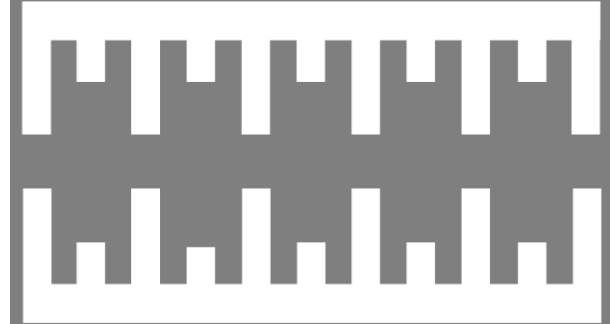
Shape 4, Piano Shape of the Road Hump Marking.
